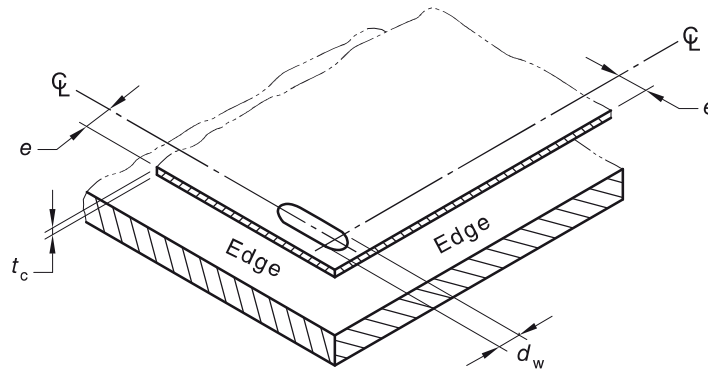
EDGE DISTANCE FOR ARC SEAM WELD
